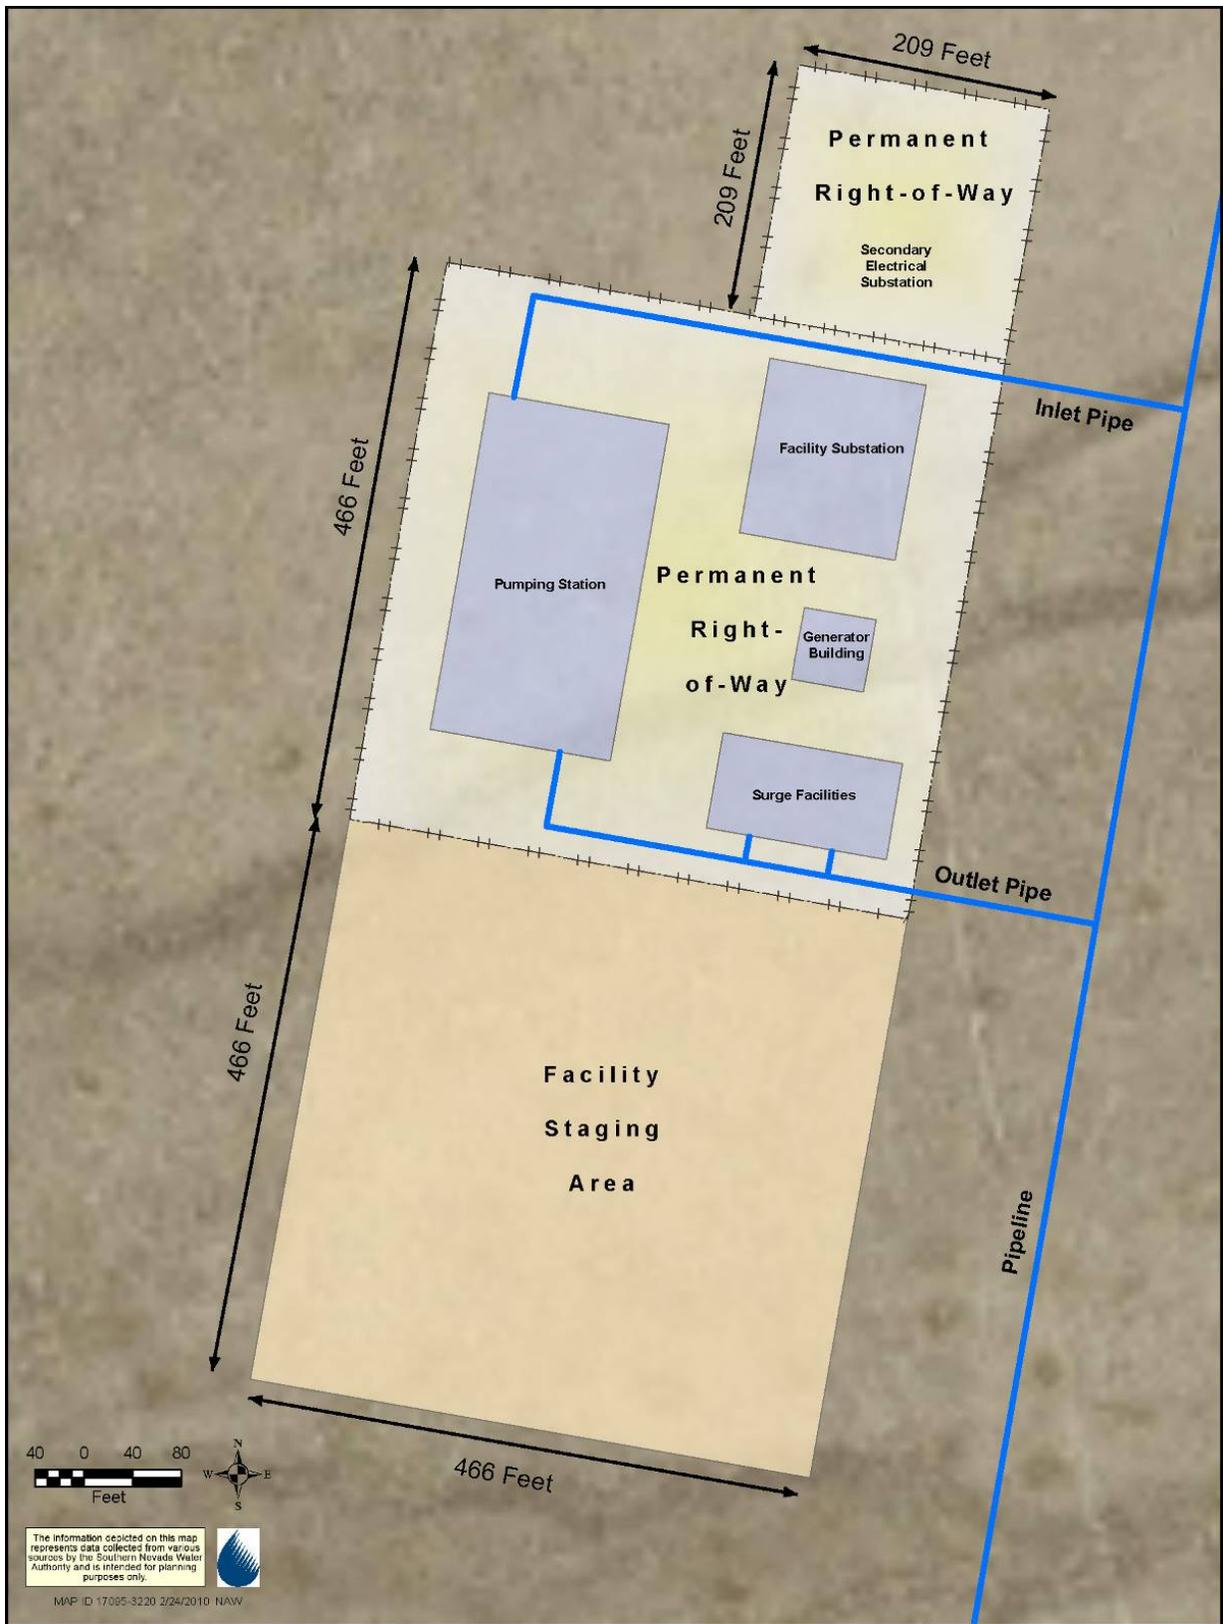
Preliminary Spring Valley North Pumping Station Site Plan
